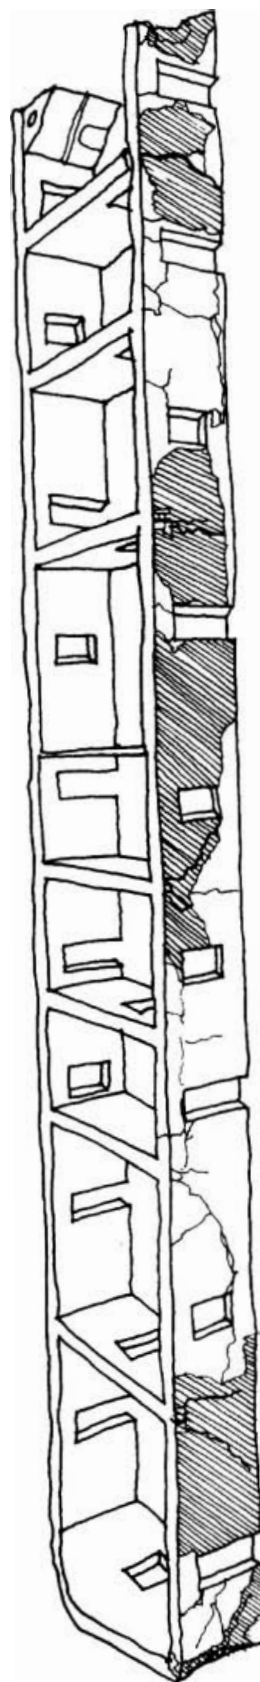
De la Osa Adobe. South elevation showing earthquake crack pattern and plaster damage.
